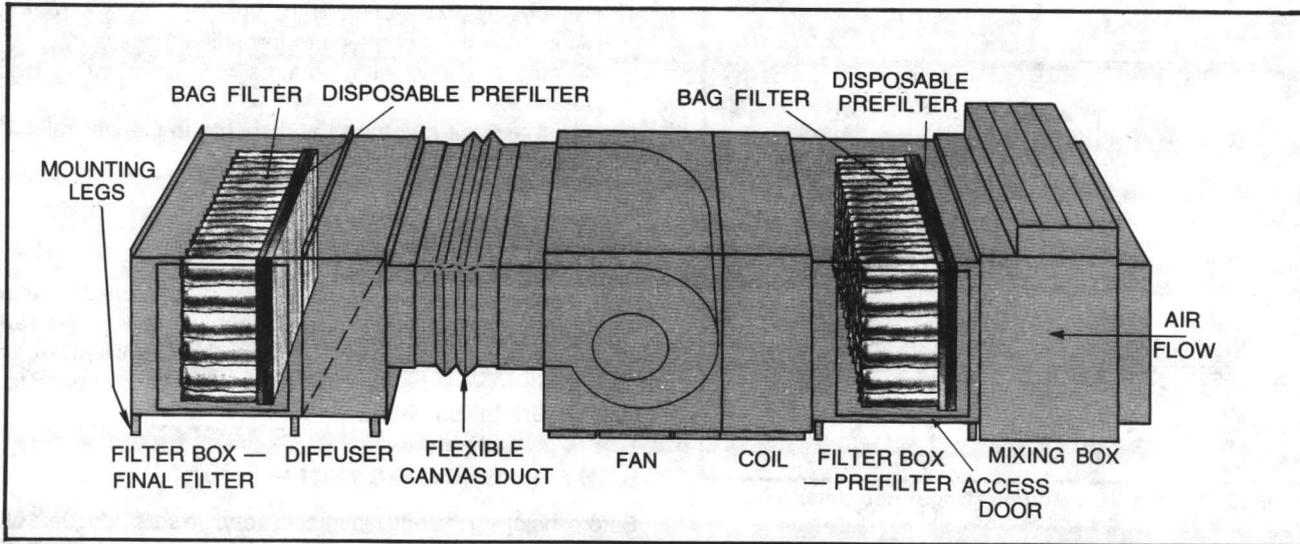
High Efficiency Bag Filter Installation With Draw-Thru Unit (Used as Pre-Filter and Final Filter)
